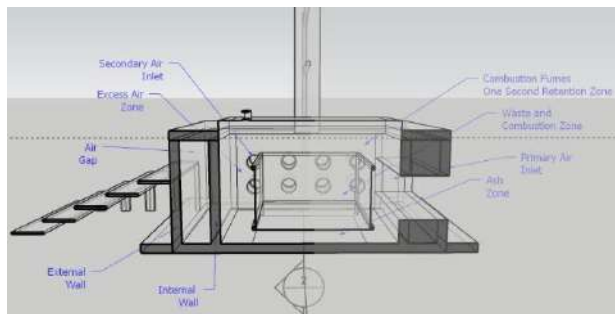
3-D, X-Ray, section drawing of the incinerator showing the combustion zone.
